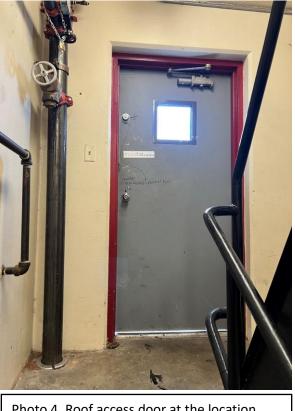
Roof access door at the location where the event occurred. Photo property of KY FACE.
